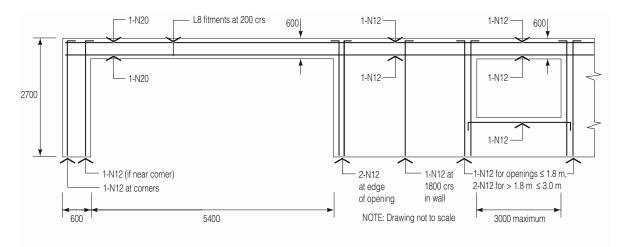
Wall Reinforcement for 190-mm Leaf for Wind Classifications N4 and C1 and 2700-mm Wall Height
